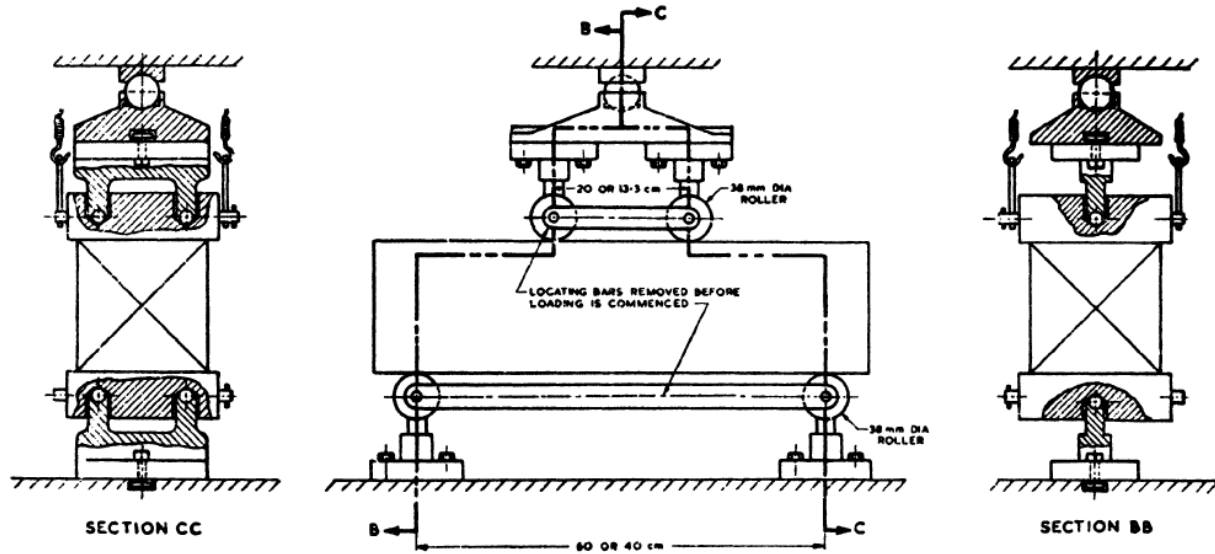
ARRANGEMENT FOR LOADING OF FLEXURE TEST SPECIMEN
